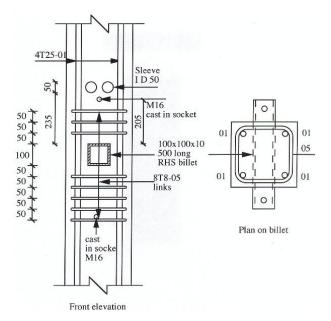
Reinforcement details in the column around the billet (front elevation, units in mm)
